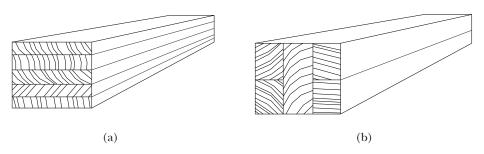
(a) Horizontally laminated beam; (b) Vertically laminated beam
